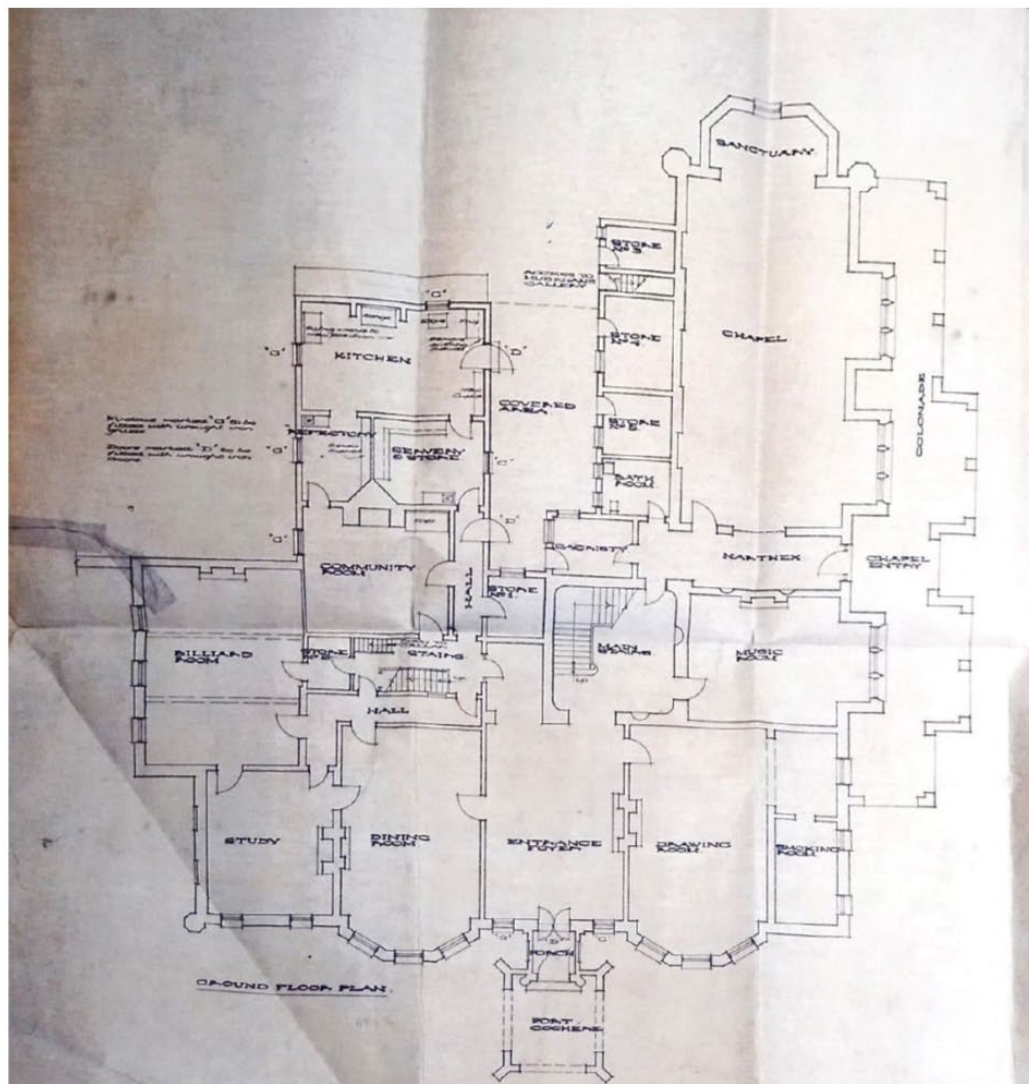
SG Hirst & Kennedy, Architects 1964, Ground floor plan 'Proposed alterations—Swifts, 65 Darling Point Rd, Darling Point for His Eminence NT Cardinal Gilroy Archbishop of Sydney St Marys Cathedral'. (Source: BA753/64, Woollahra Municipal Council)
